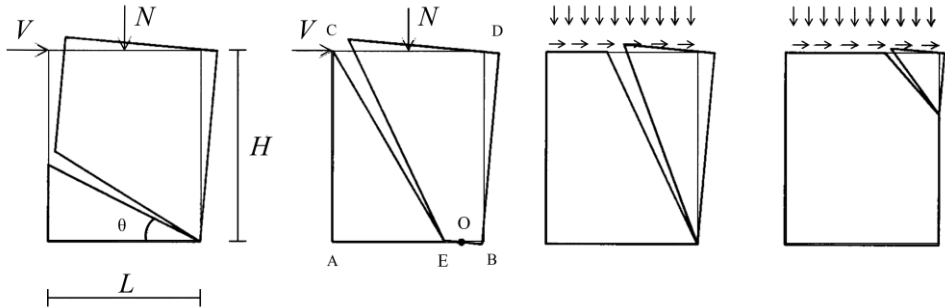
In-plane failure kinematic mechanisms of masonry piers [7]
